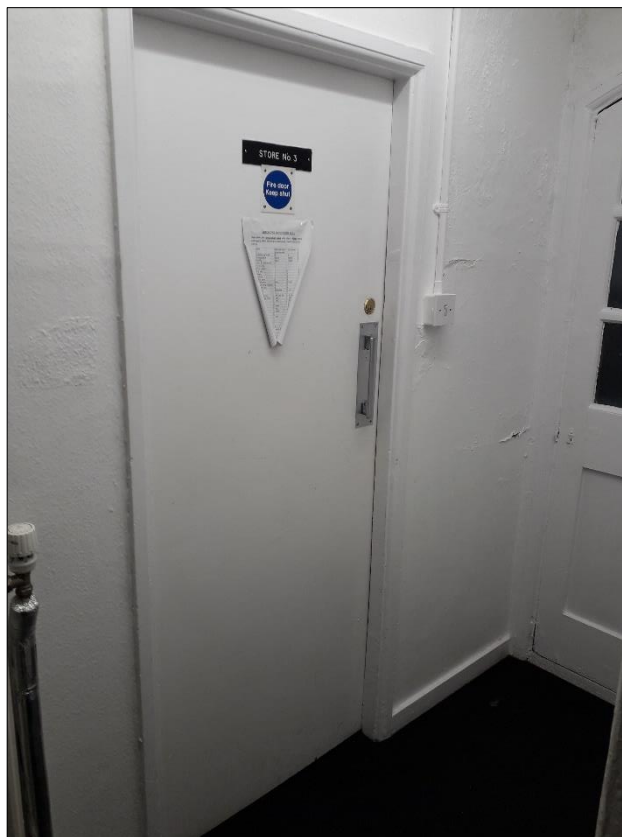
room 02-213, looking towards existing doorway to room 02-214 [03.04.2023]
